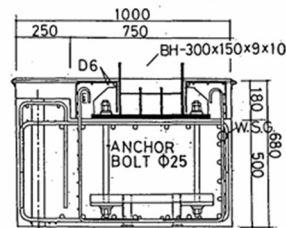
(a) Longitudinal section of C-Type specimen (unit mm)
